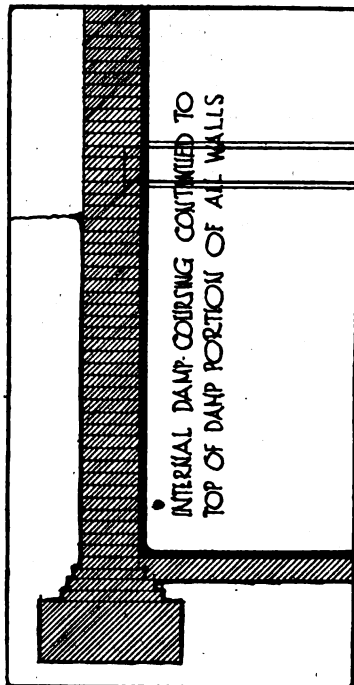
Method of damp-proofing basement rooms in an existing building.
